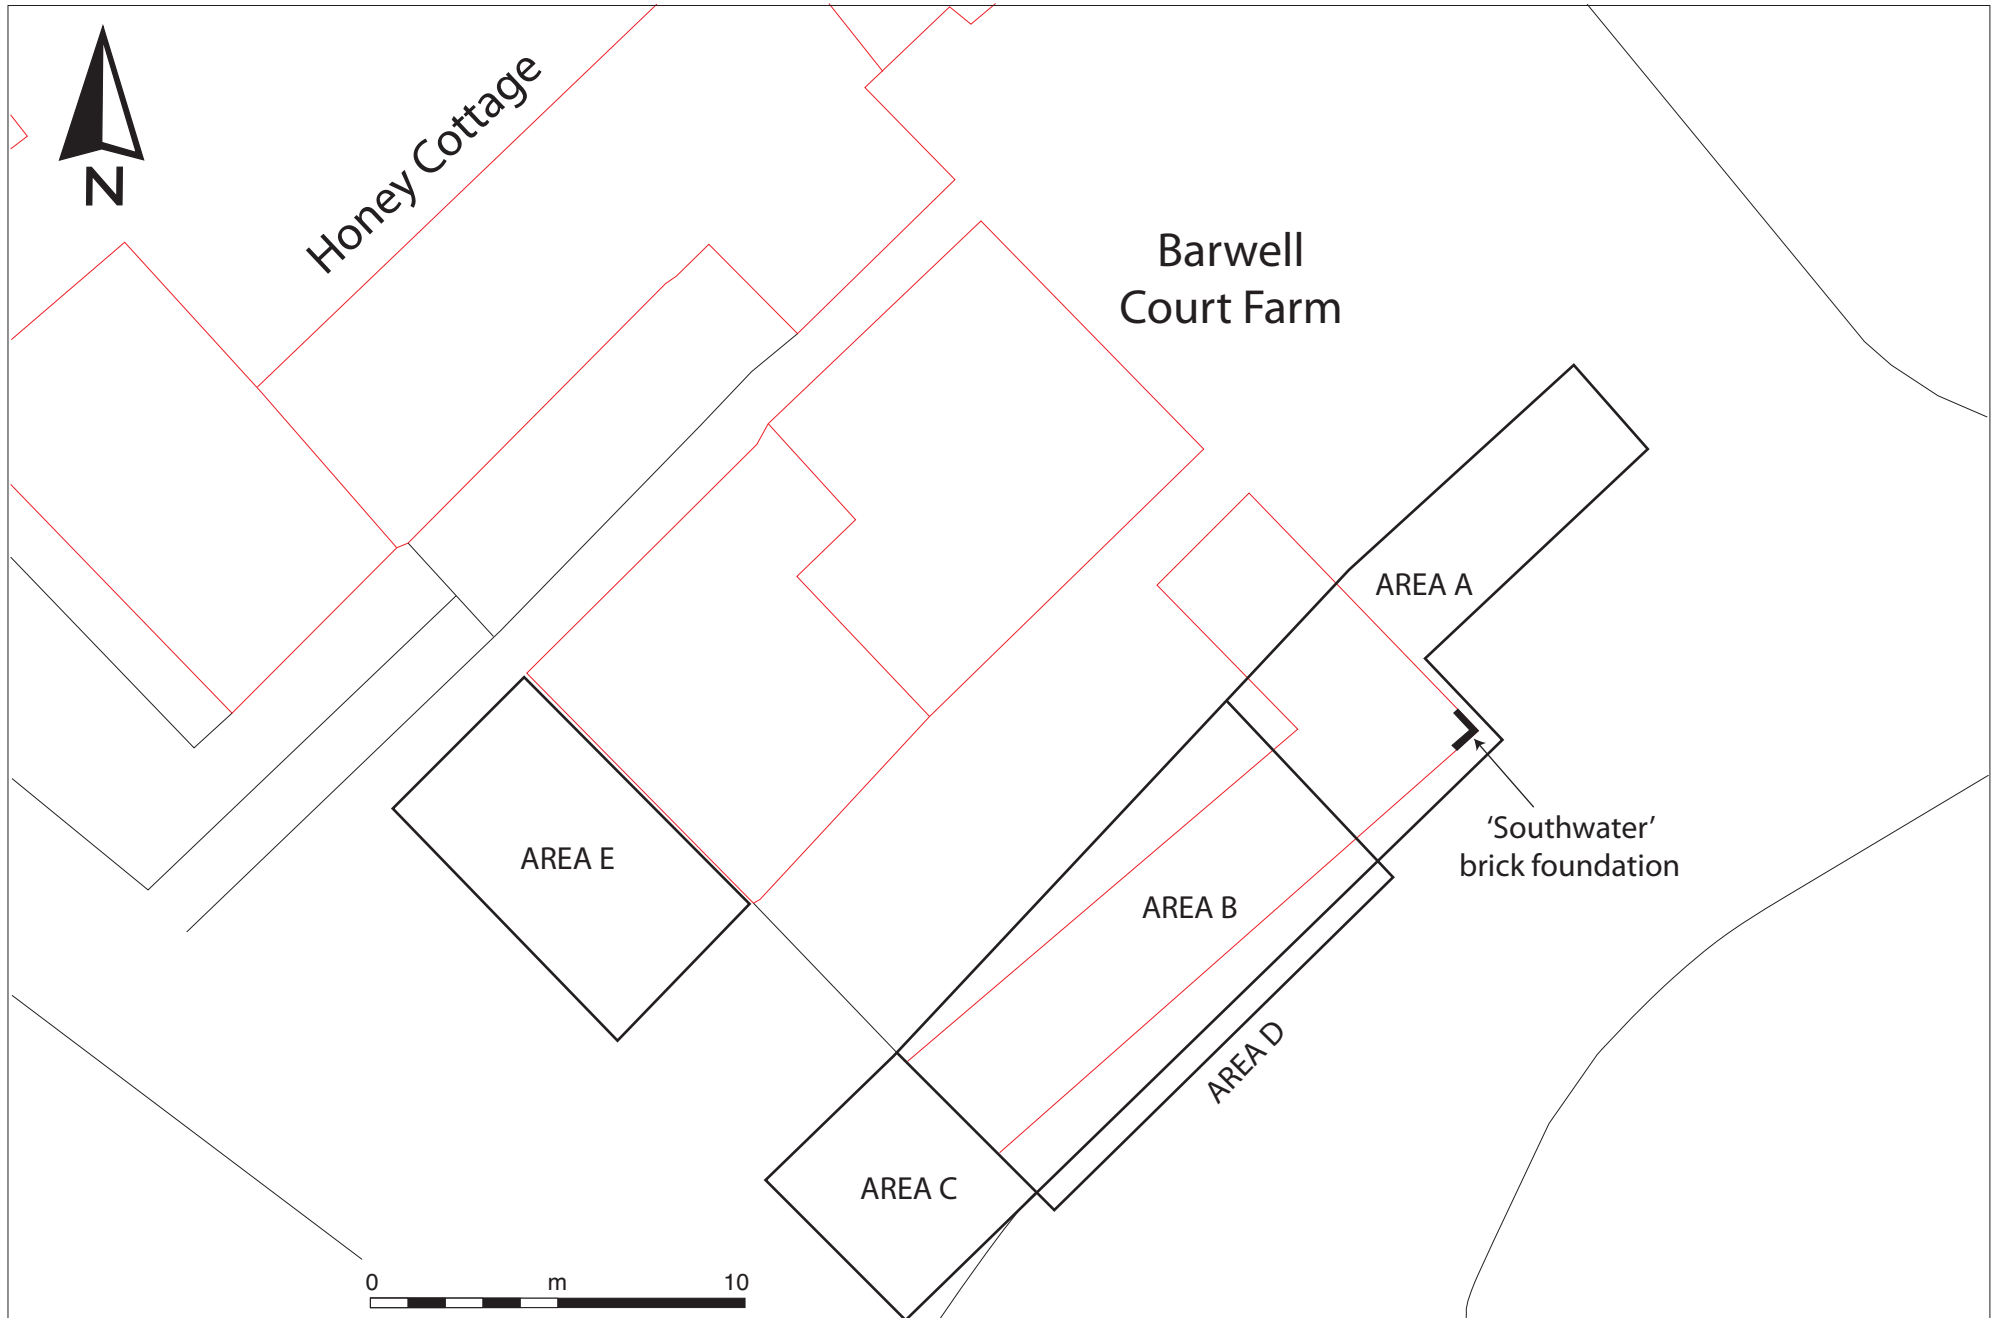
Barwell Court Farm, Chessington, Surrey: locations of exterior ground level reductions
